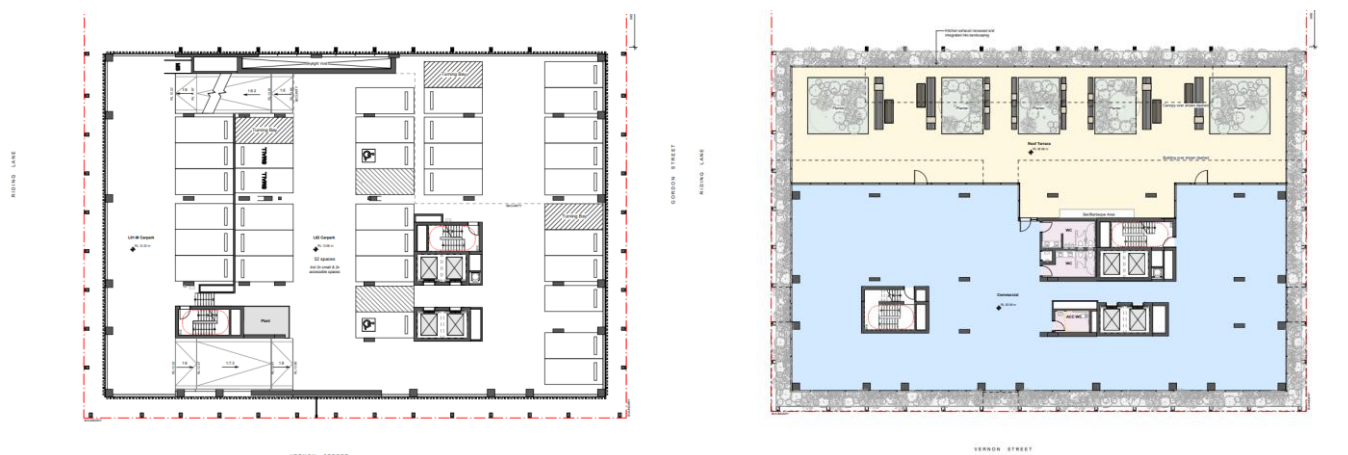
Typical podium floorplate for parking (left) and commercial floor (right)
